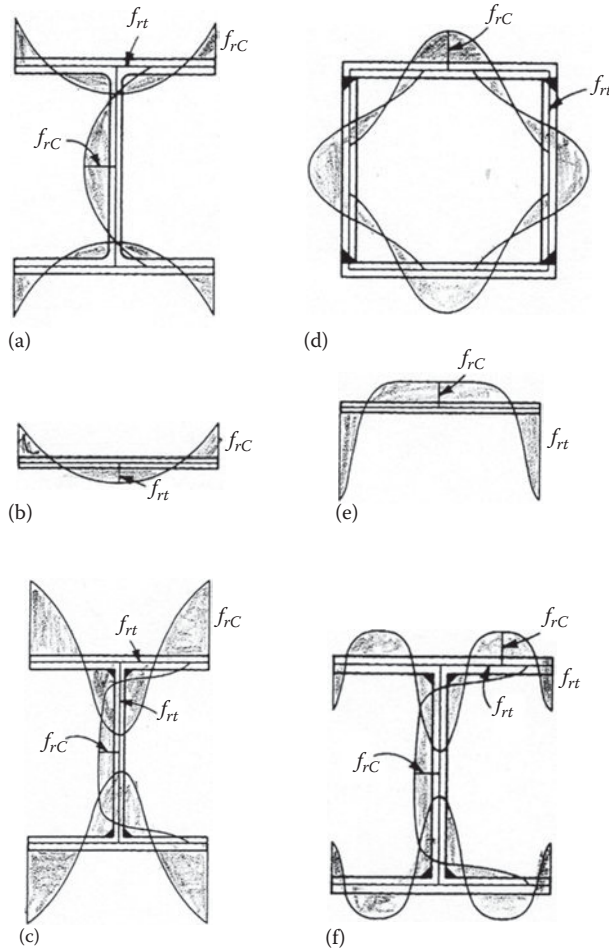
Residual stresses: (a) WF, (b) rolled plate, (c) H-section from UM plates, (d) welded box, (e) frame-cut plate, and (f) H-section from plane-cut plates.
